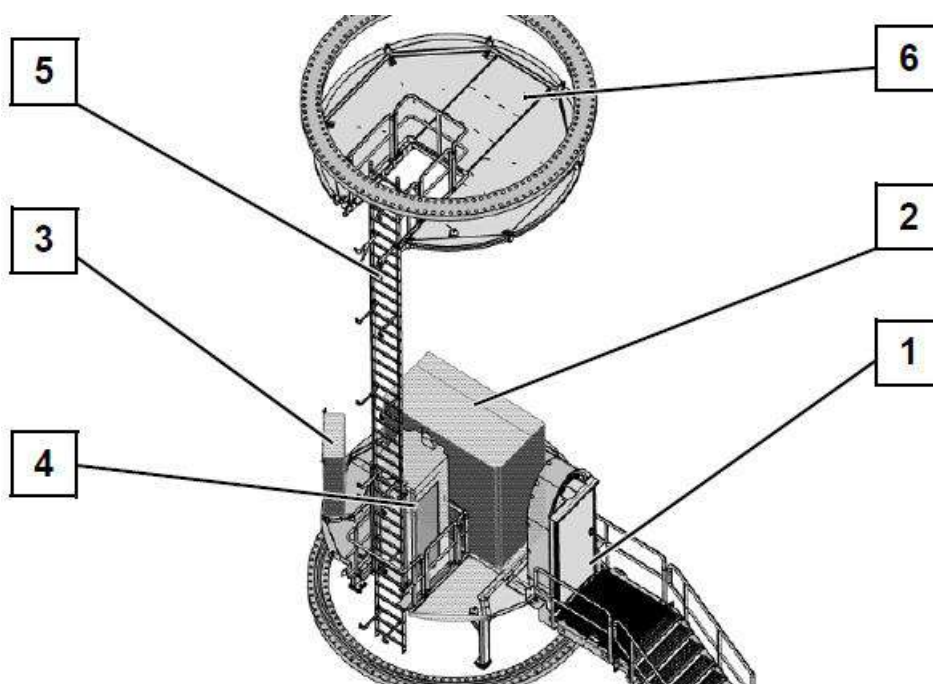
Overview of the bottom section in a tubular steel tower, tower plates not shown
